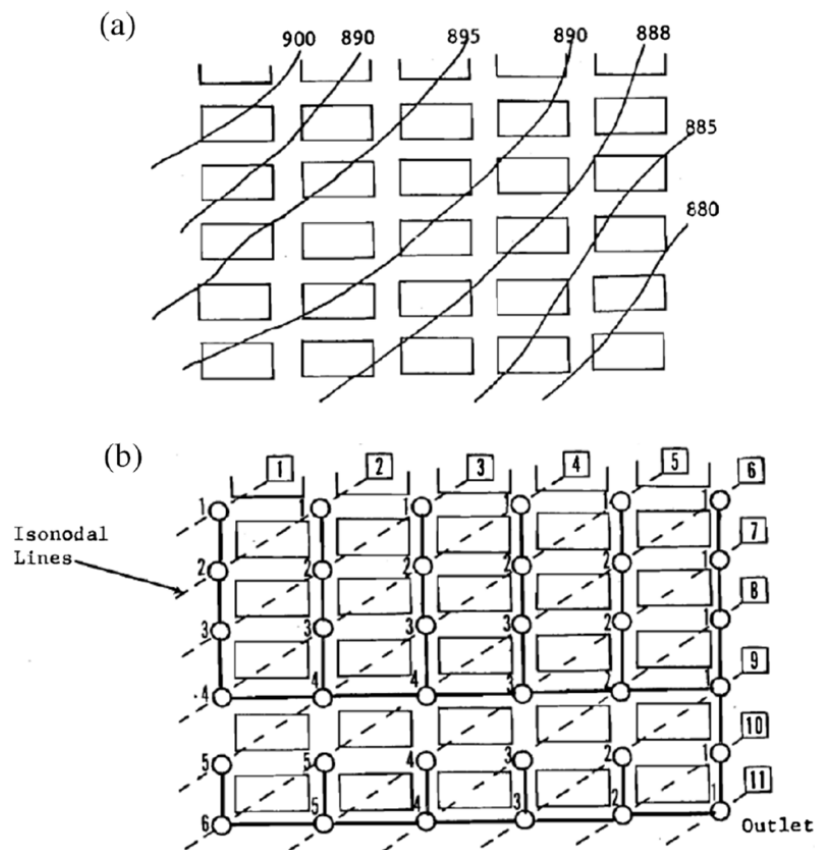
Iso-nodal Line Method, Including a) Street Layout and Surface Elevation Contours and b) Layout and Iso-nodal Lines (Mays, 1976).
